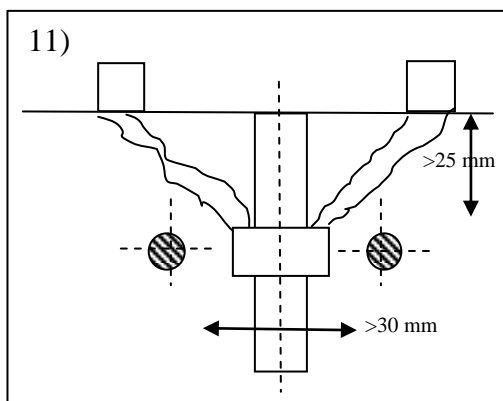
CAPO-TEST failure on shotcrete with steel fibers
